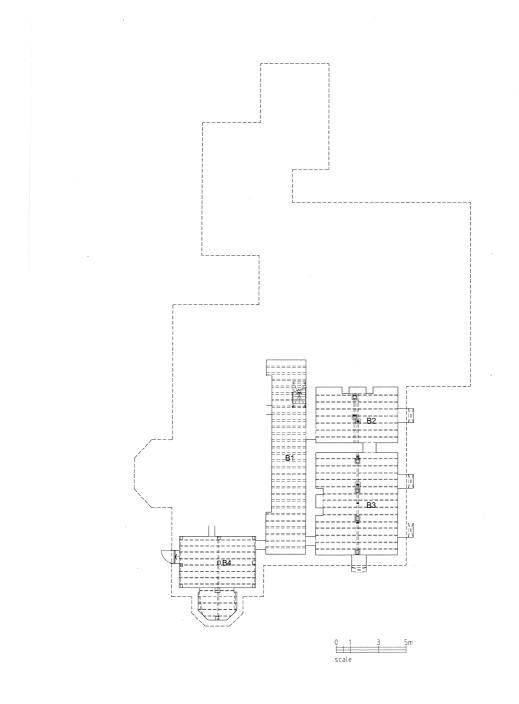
Basement floor plan of the House, existing conditions, not to scale. Source: Tanner Architects 2010.
